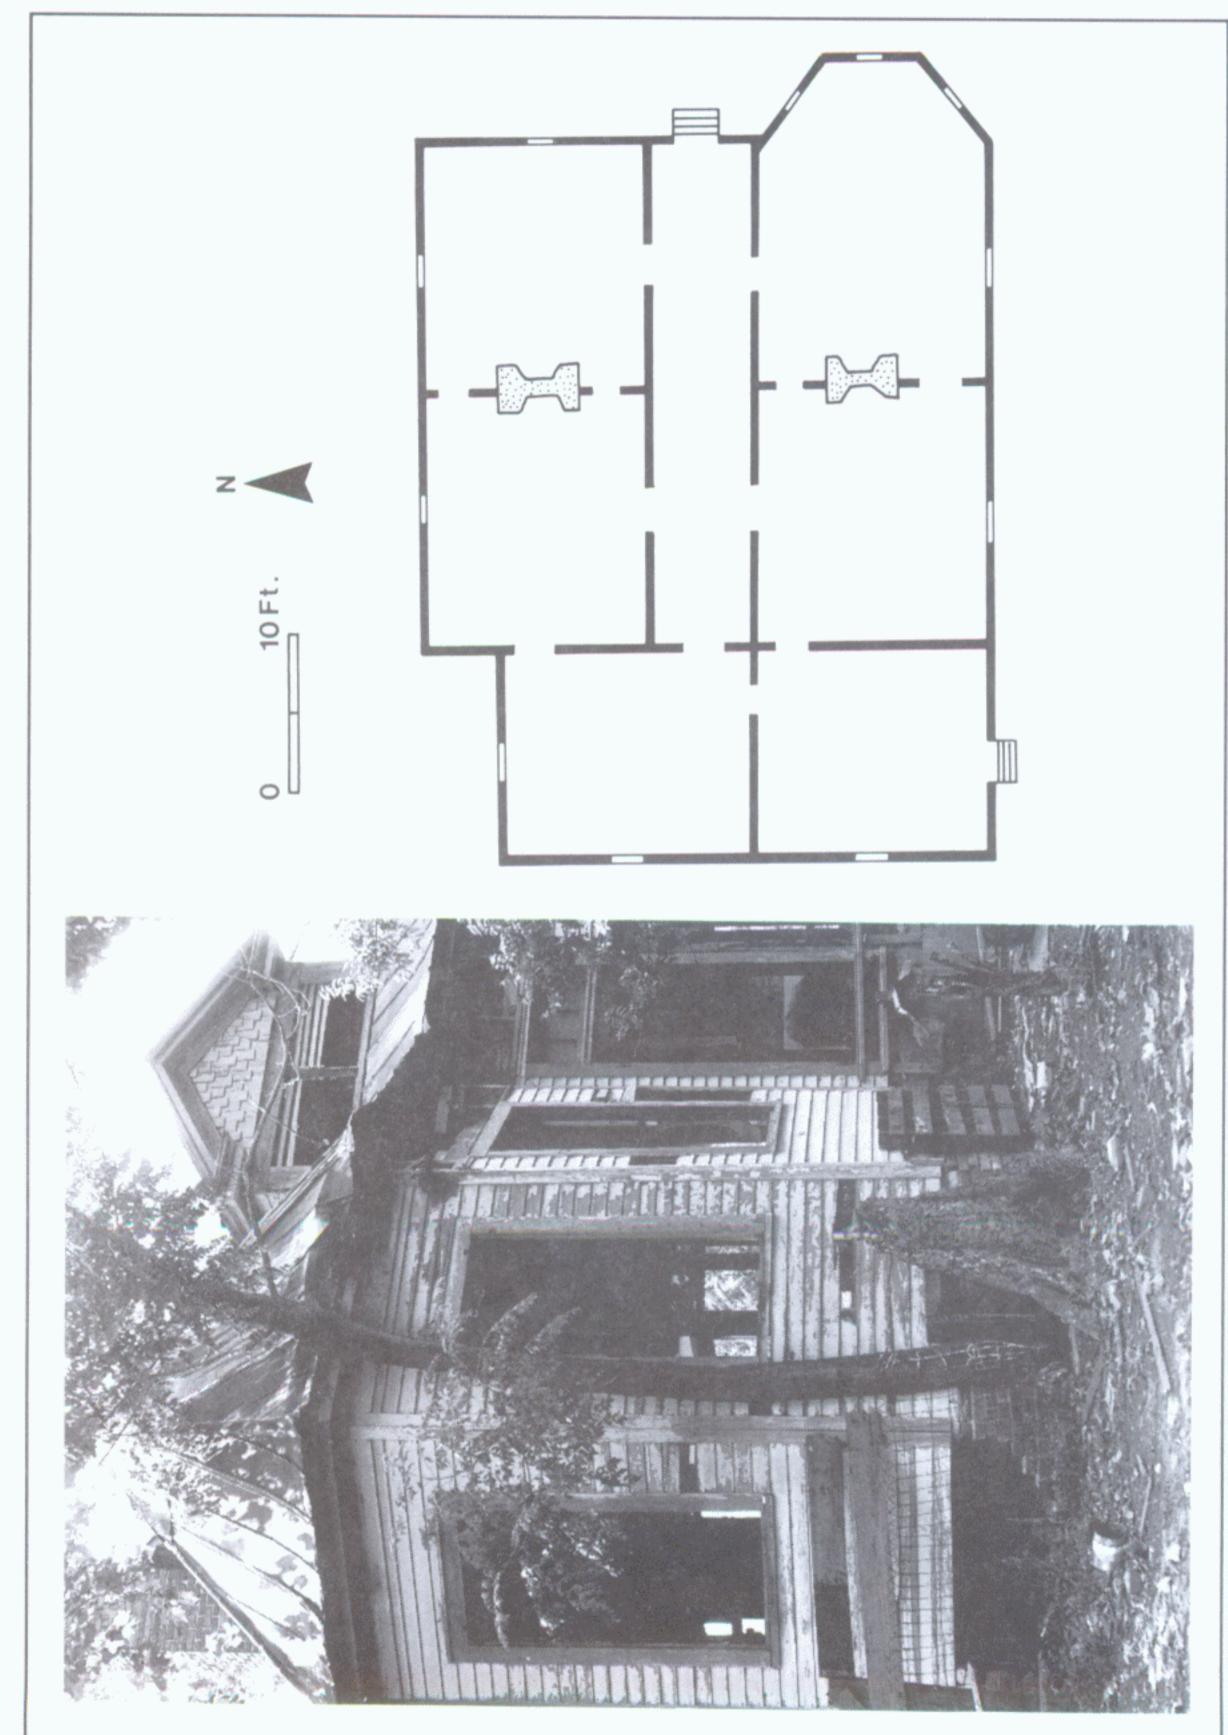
Exterior View and Floor Plan of Standing Structure on 9RI158.
